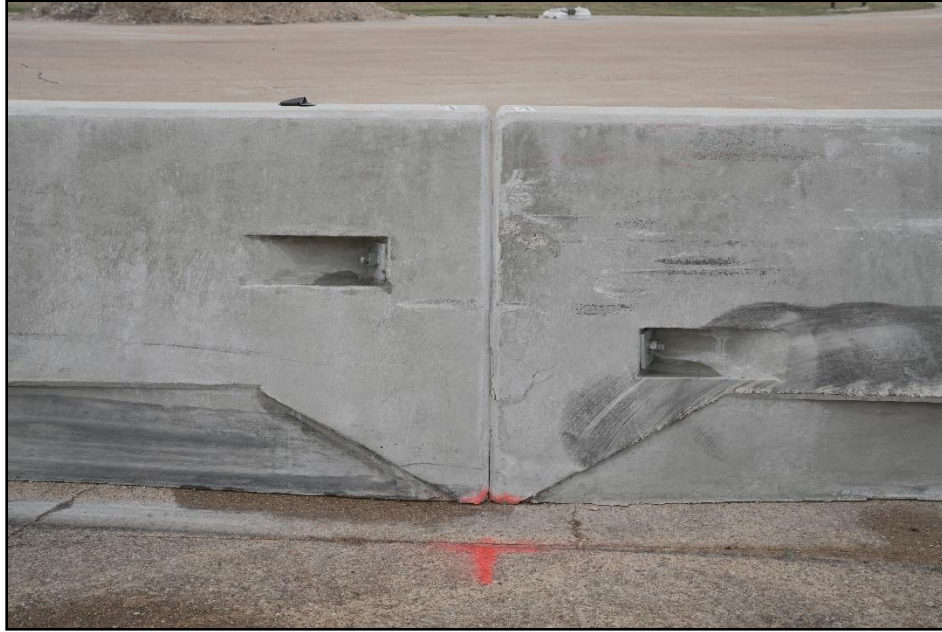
Large-Scupper Portable Concrete Barrier after Test at the Joint between Segments 3 and 4 for Test 440873-01-1.
